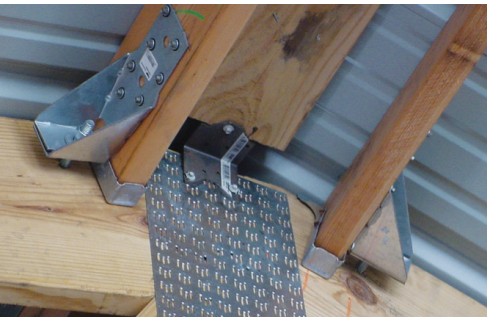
Chord reinforcing hardware on two ridge purlins. Bracket between ridge purlins is supporting a beveled ridge nailer.
